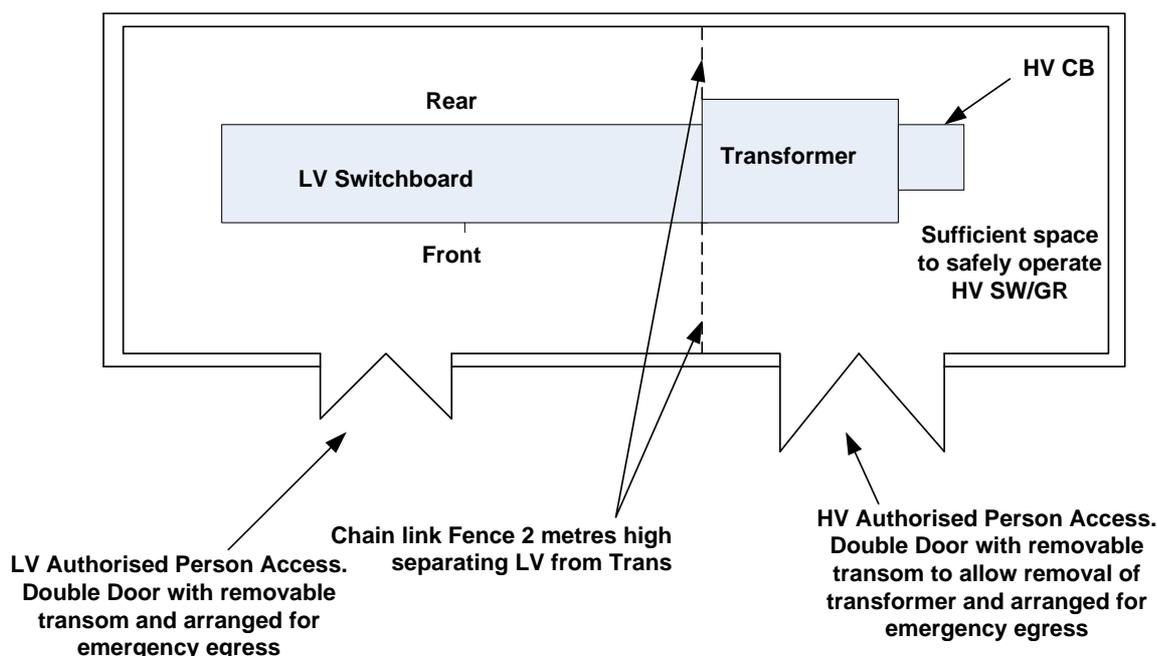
Typical Layout of Packaged Substation 'Switch room'
